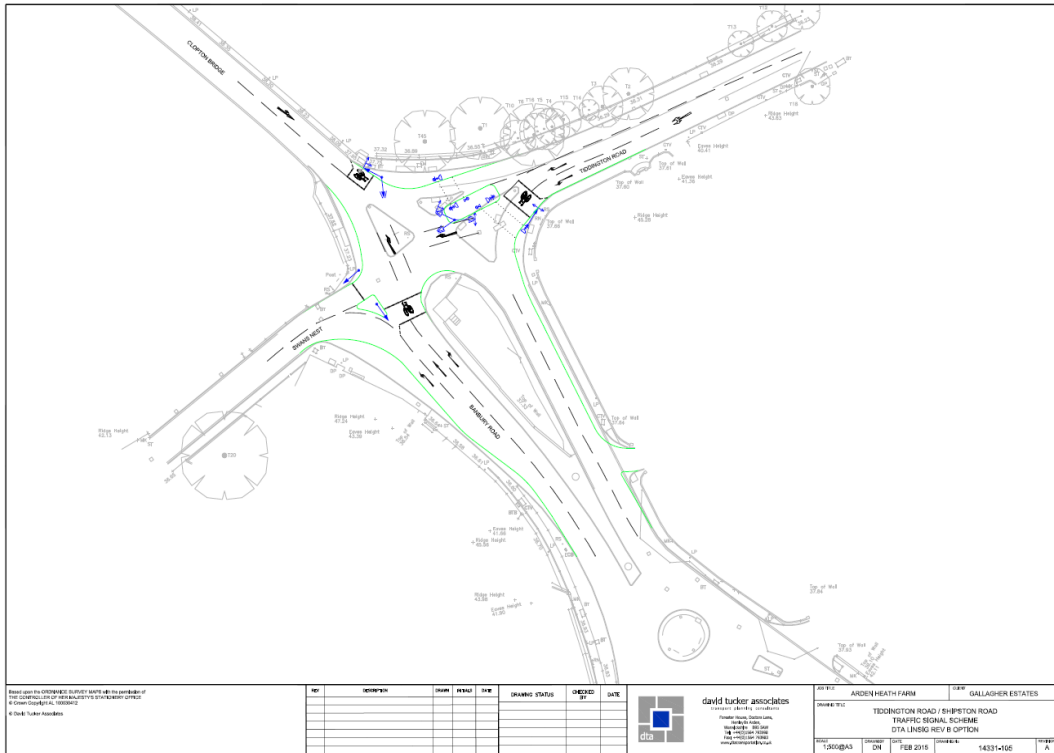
Clopton Bridge/Tiddington Road Scheme Proposals
